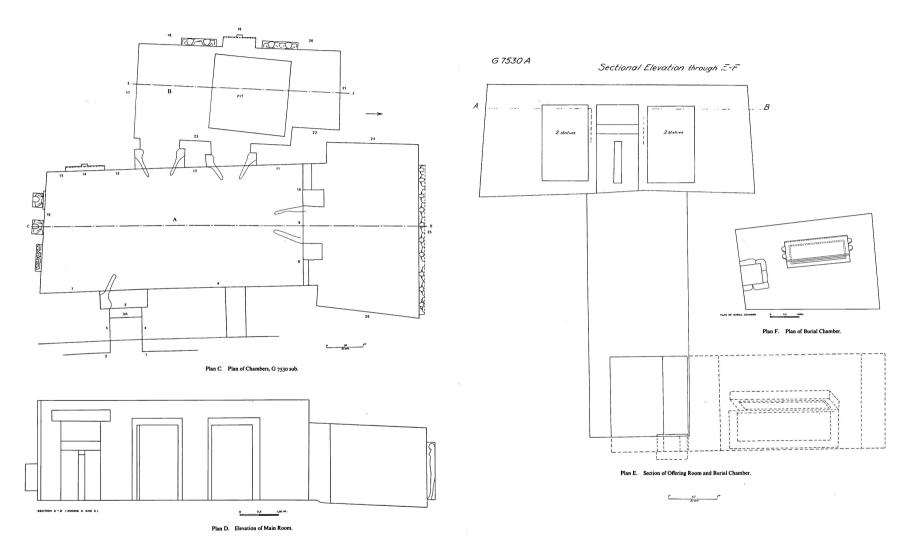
Floor plans, sections, and elevations used to construct the 3D model (Dunham & Simpson, 1974a, p. 39f.).
